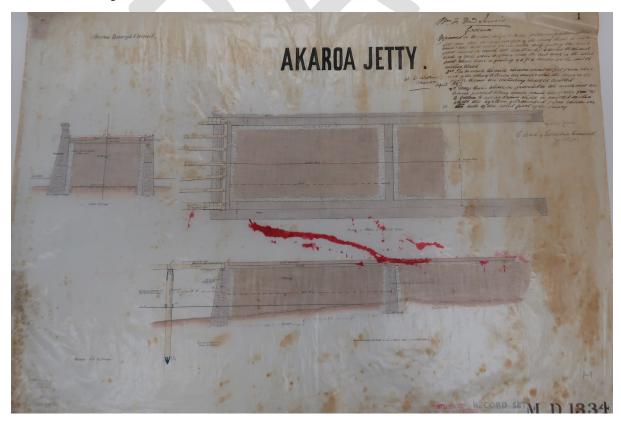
Section drawings of the concrete abutment to the timber portion of the wharf (Wellington Archives New Zealand).
